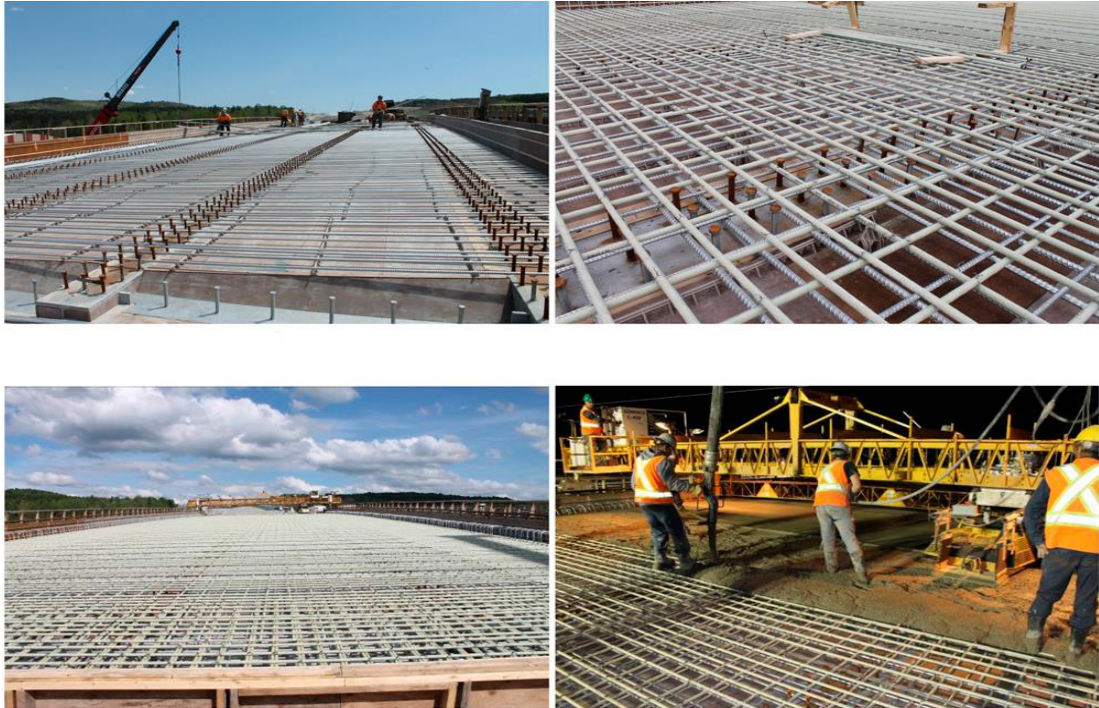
A recent application of GFRP bars in a bridge deck slab (Ahmed et al. 2014)
